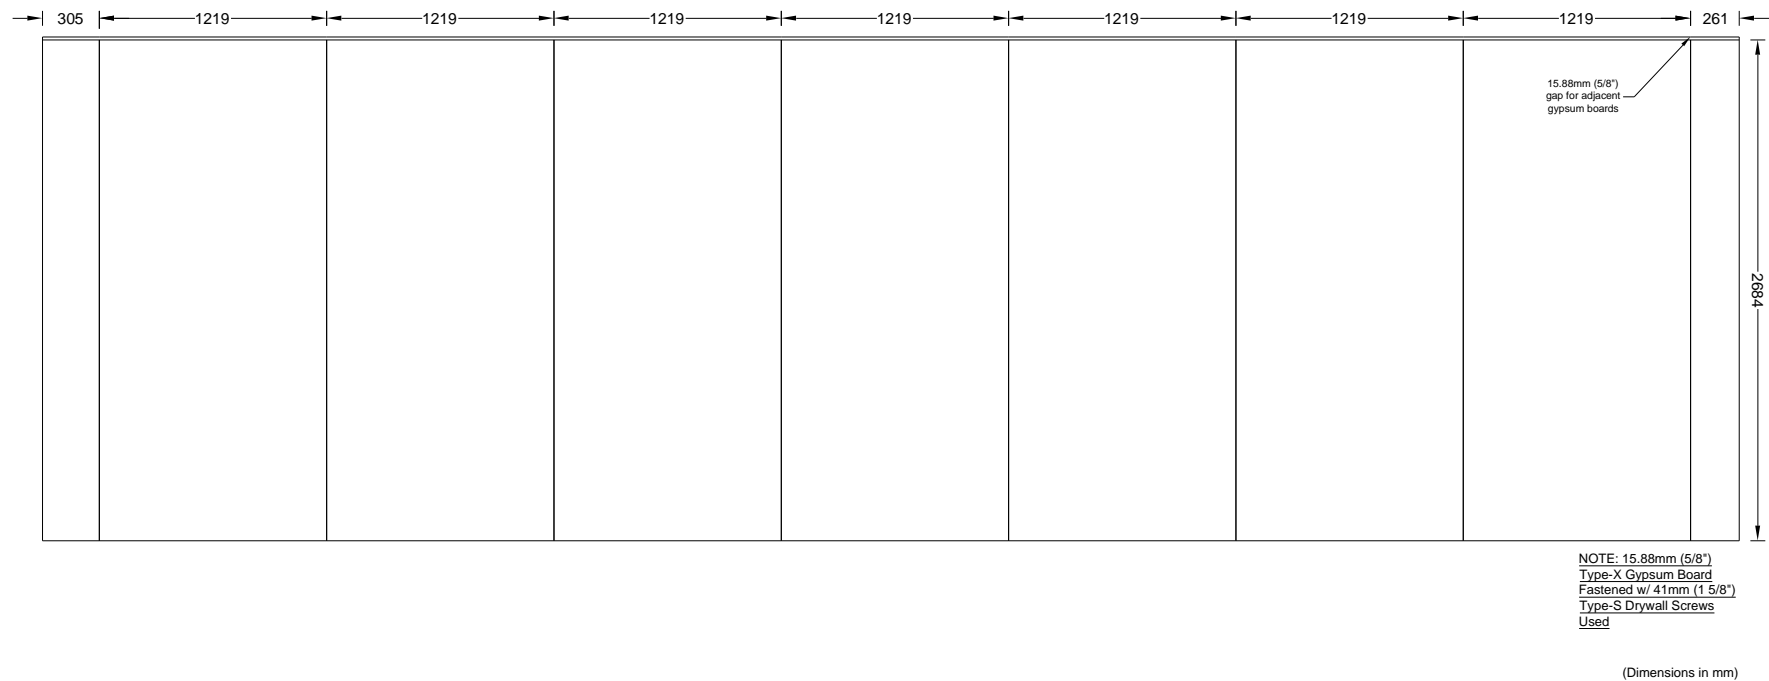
Test 1-1 Large Compartment CLT - W1 - Gypsum Layout - Base Layer
